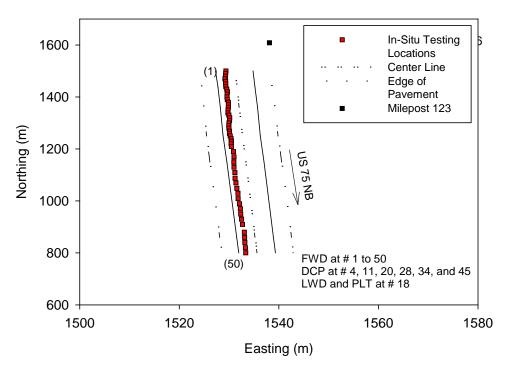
Test section plan layout with RTK PGS locations US 75 Osage County, Kansas
